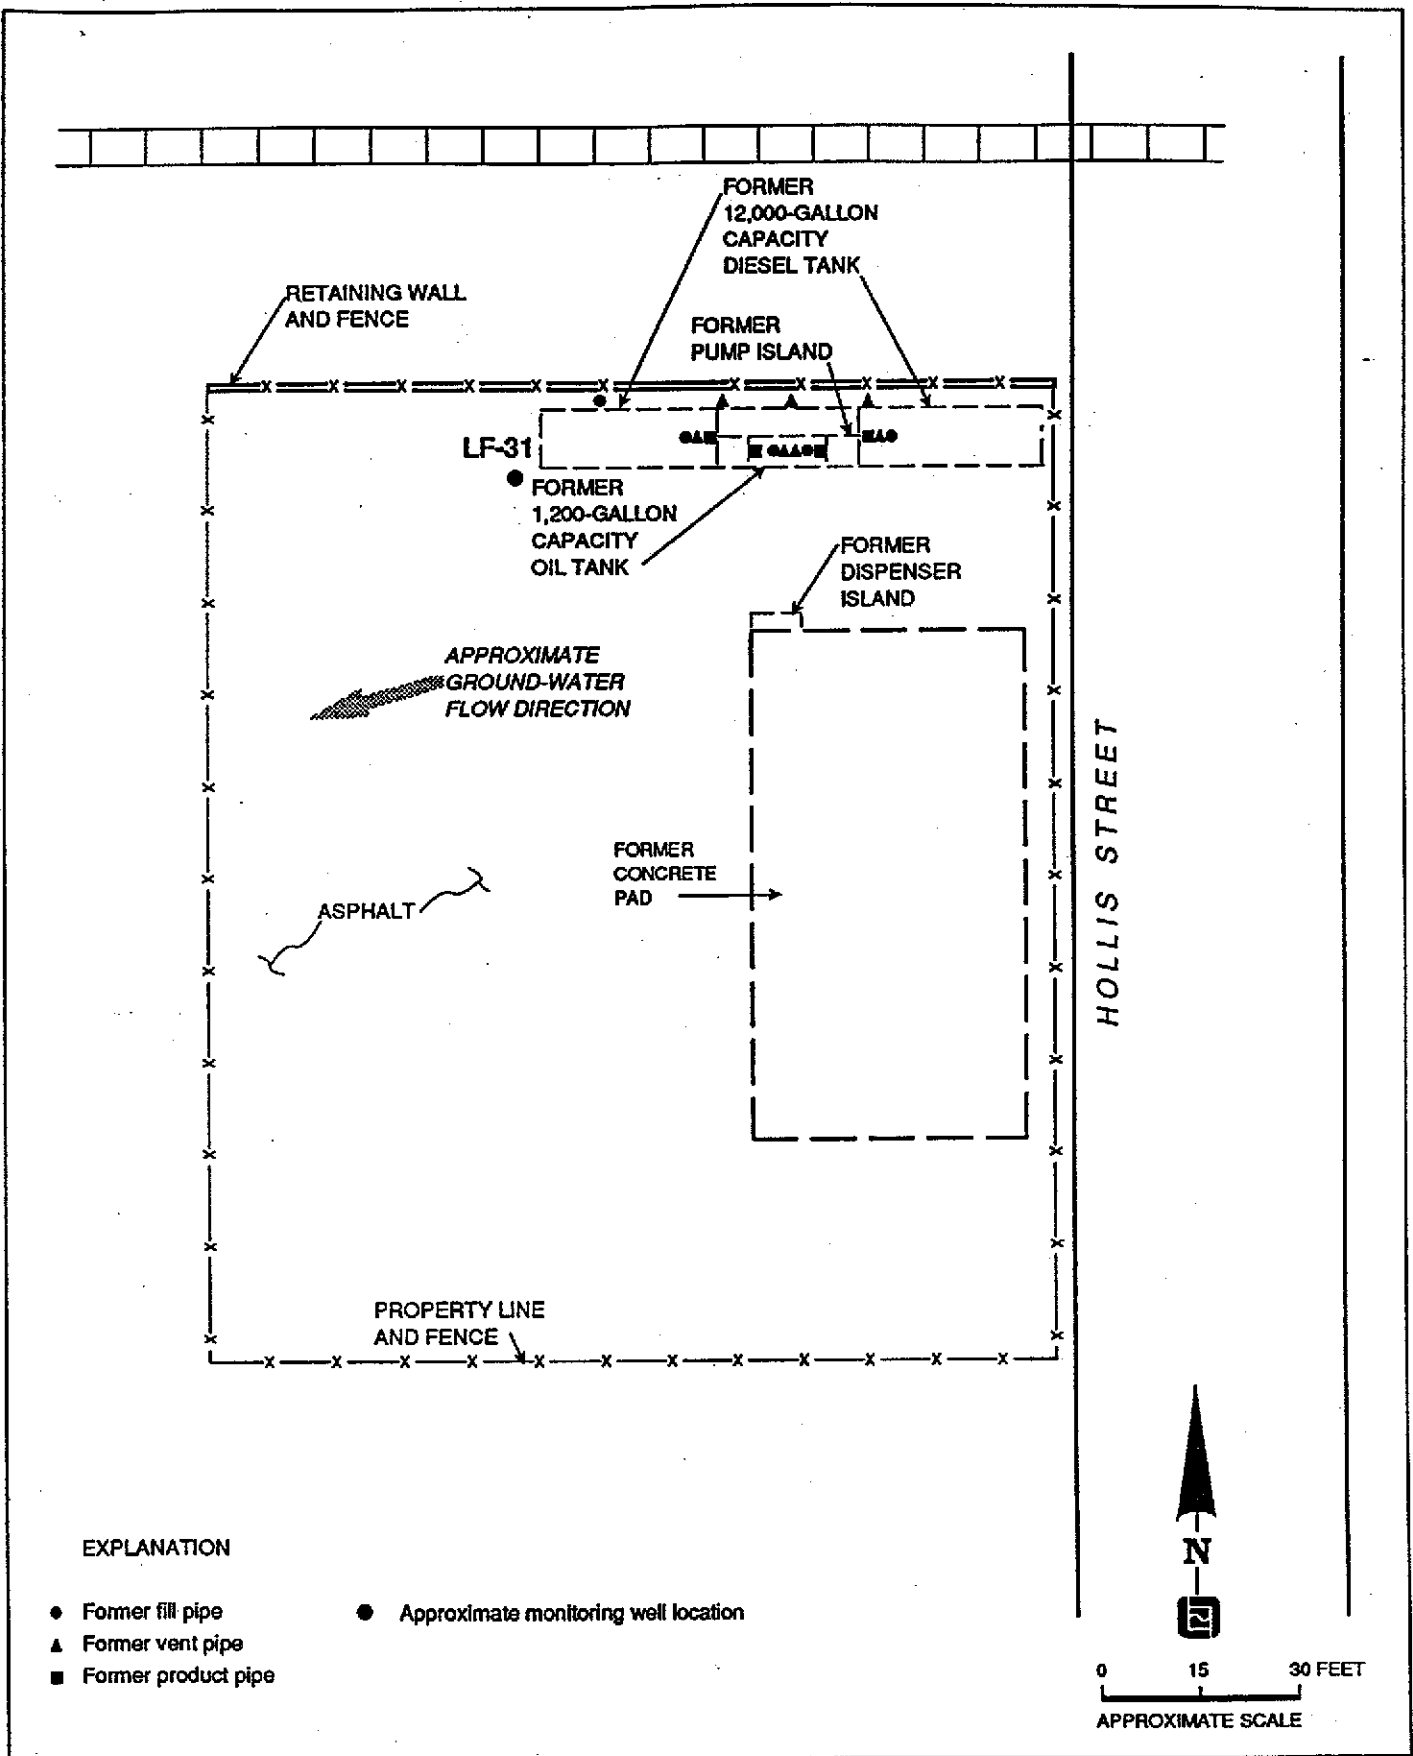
SITE PLAN SHOWING MONITORING WELL LF-31
